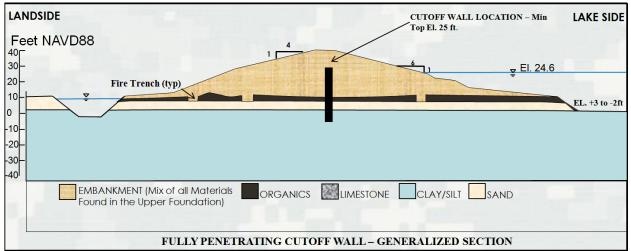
Generalized Section of Fully Penetrating Cutoff Wall
